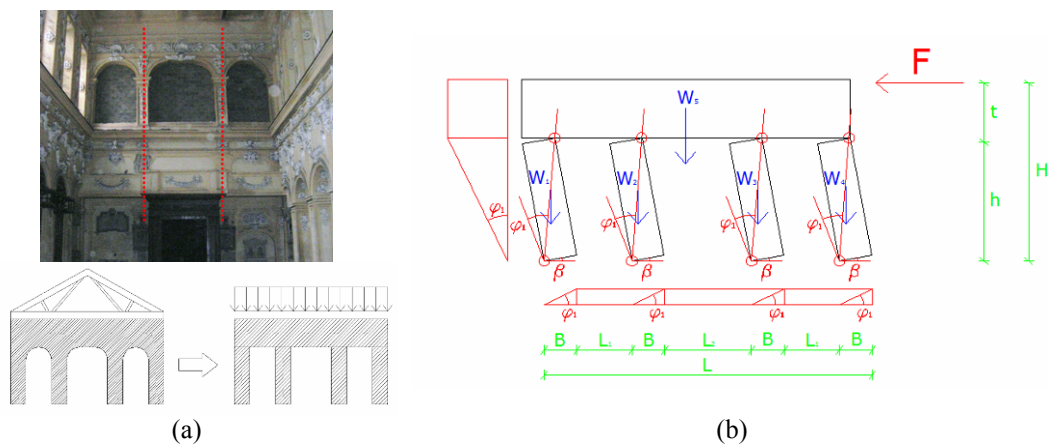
West wall macro-element: (a) simplified masonry portal; (b) loads and kinematic chain.
